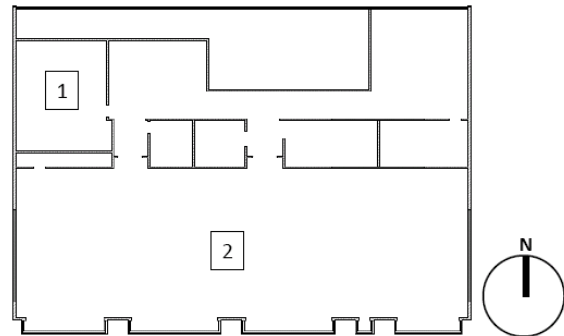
Plan section Level 2 of the Arts and Media building with the specified rooms were PMV has been assessed in this research.
